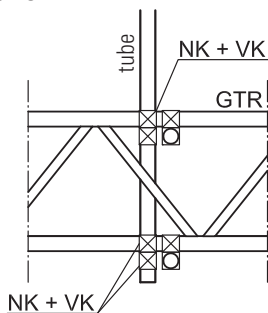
Version: Aluminium U-profile with half-couplers for decks
